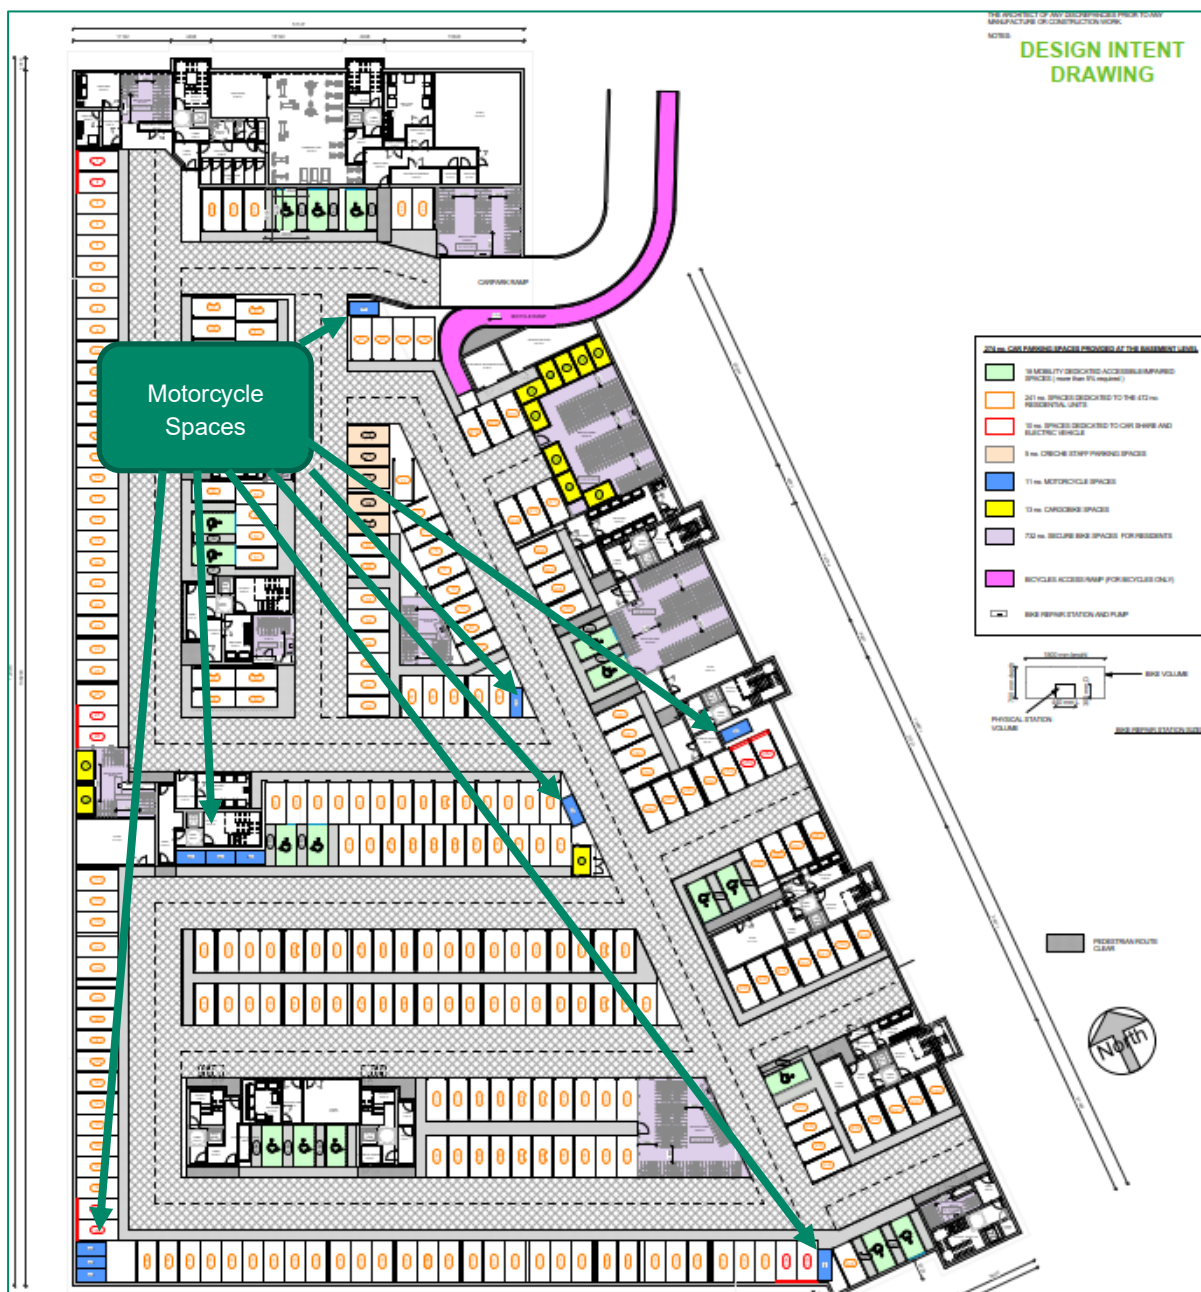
Motorcycle Spaces Basement Layout (Source: C+W O'Brien Architects Drawing No. 092035)
